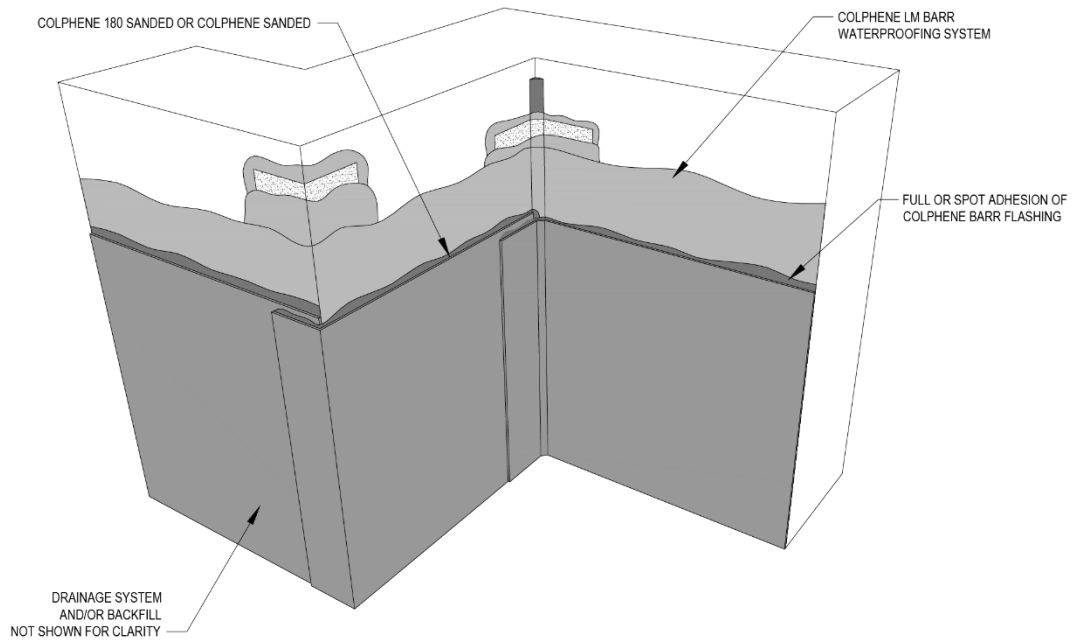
COLPHENE® SANDED or COLPHENE® 180 SANDED Protection Course At Inside/Outside Corners
